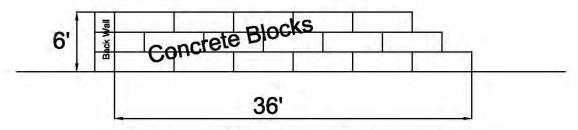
EXHIBIT B PRELIMINARY BLOCK LAYOUT
